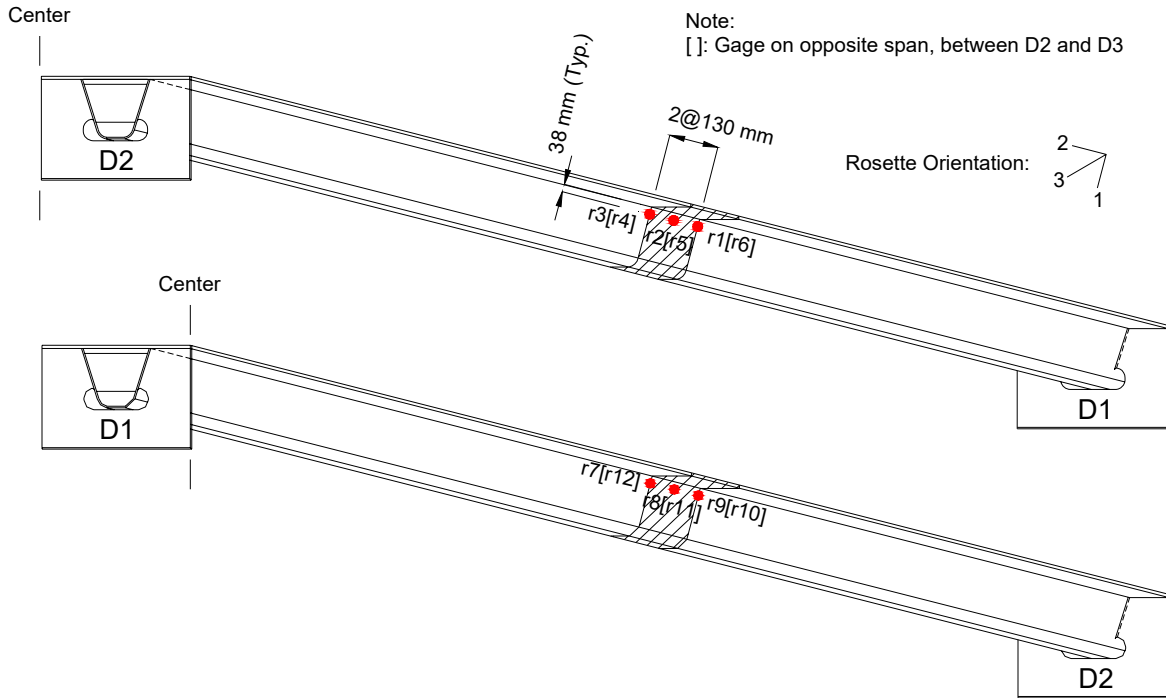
Specimen 5: Strain Gages in Outer Surface of Rib R2 near Rib-to-Deck Welds
